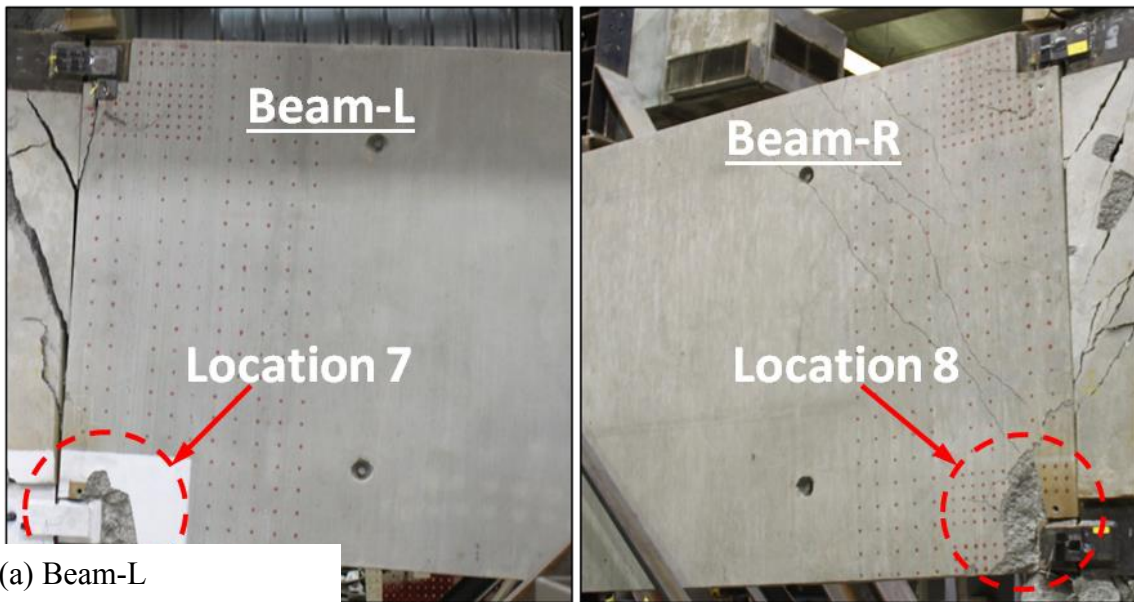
Elevation view, posttest damage of the spandrel beams near the top of the center column/stud
